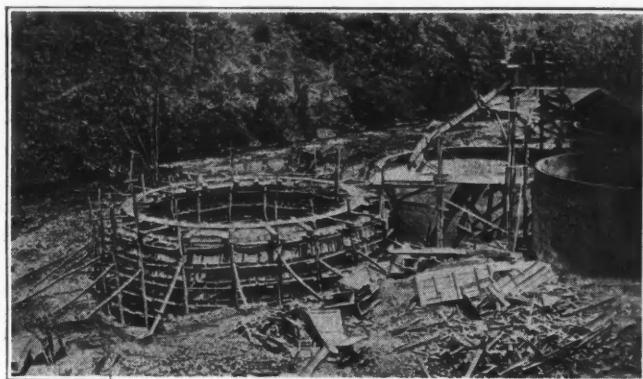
REINFORCEMENT DETAILS. 39-FT. CONCRETE DECANTER TANK
